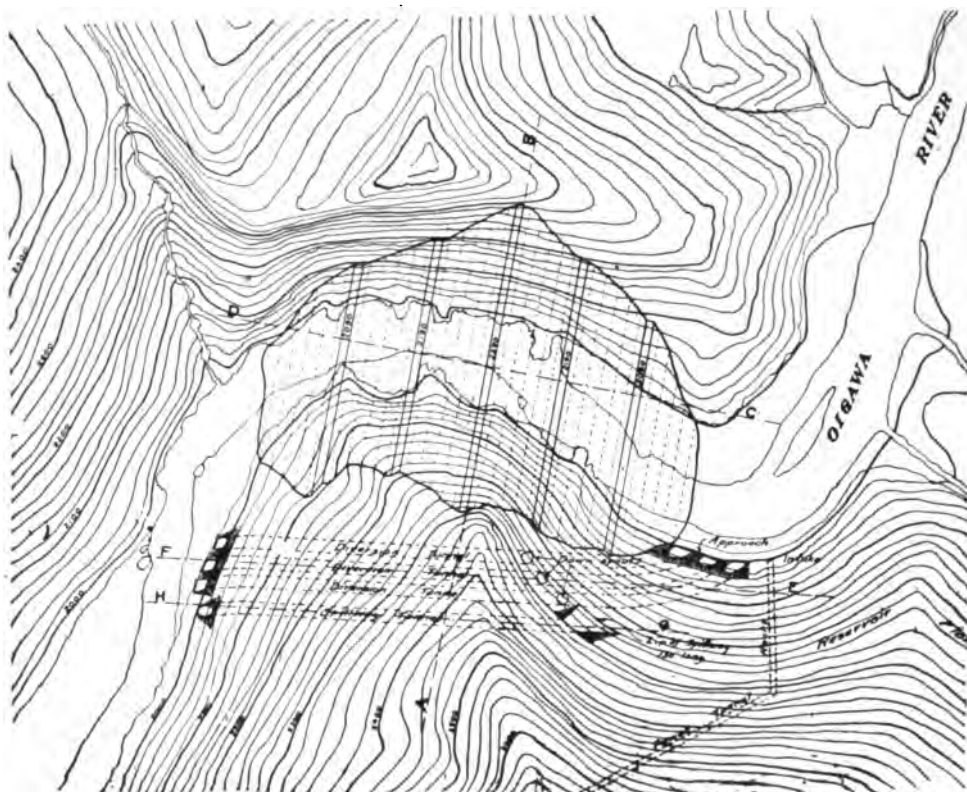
CONTOUR PLAN OF HYDRAULIC-FILL DAM PROJECTED FOR POWER STORAGE AT IKAWA ON THE OIGAWA RIVER, JAPAN.
